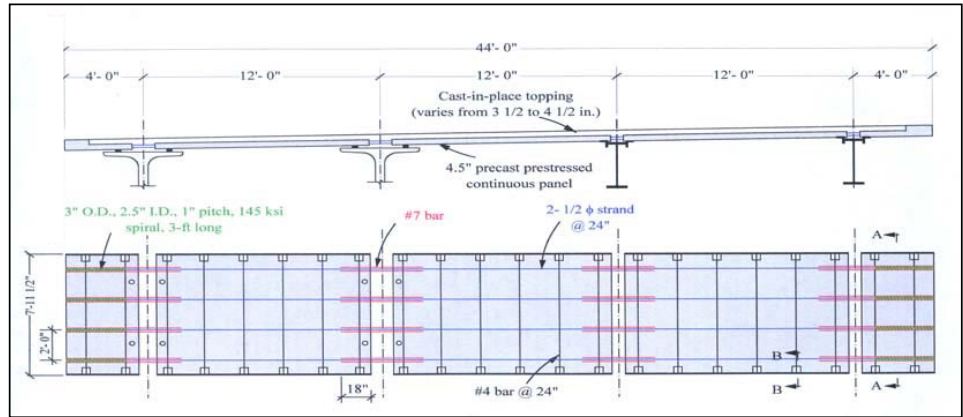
Elevation & Plan Views of the NUDECK SIP Panel system
